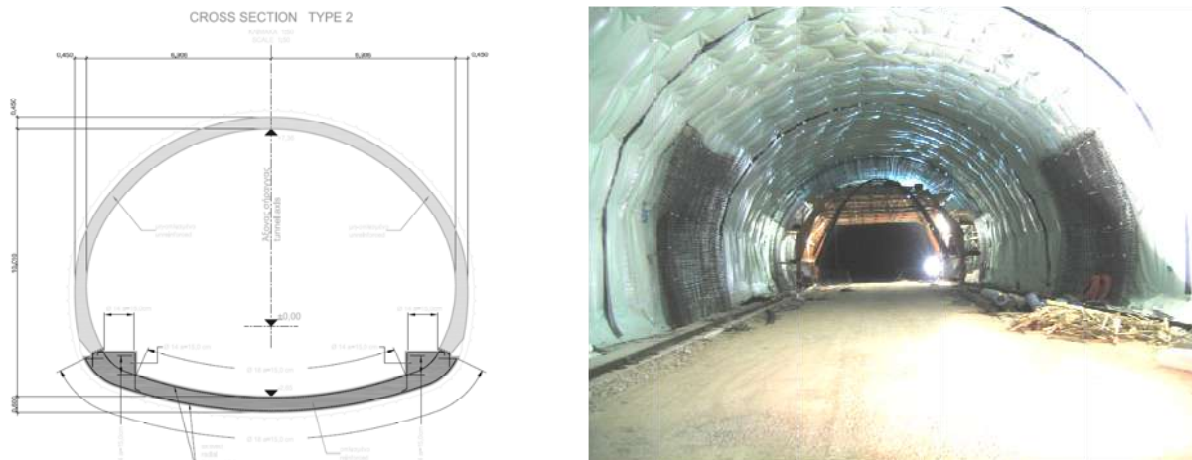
Unreinforced Final Lining for Type II and reinforcement at drainage niche for unreinforced type I
